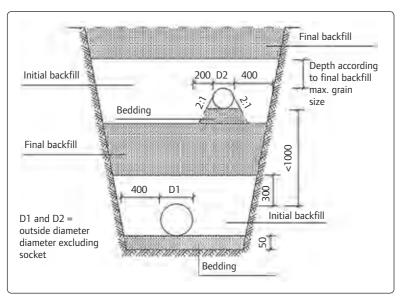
Pipe trench bedding and initial backfill, with a vertical free distance of $\geq 1,000$ mm between pipes.
